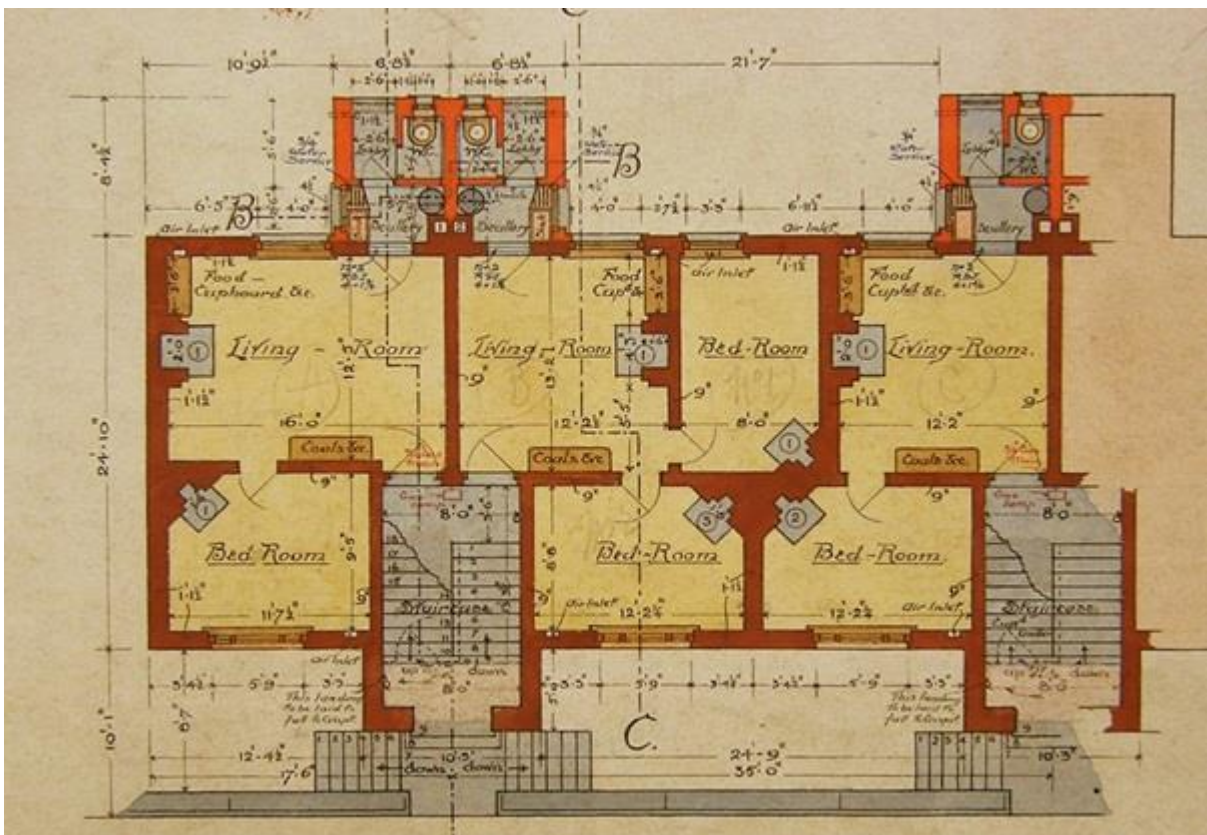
Council Buildings, ground floor plan (LMA ref: LCC/AR/HS/03/057)
